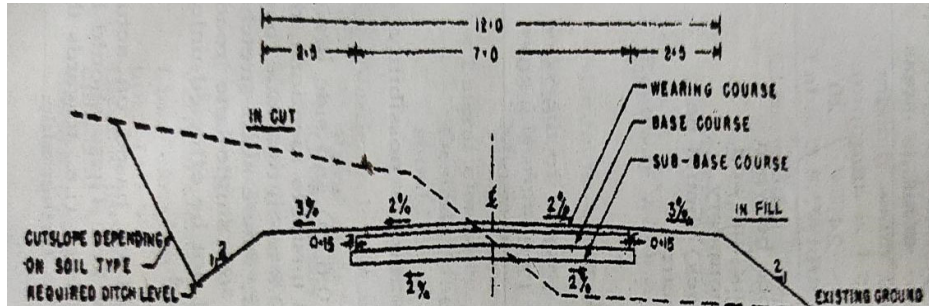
P(d) Typical Cross section of a 2-lane Major District Road
